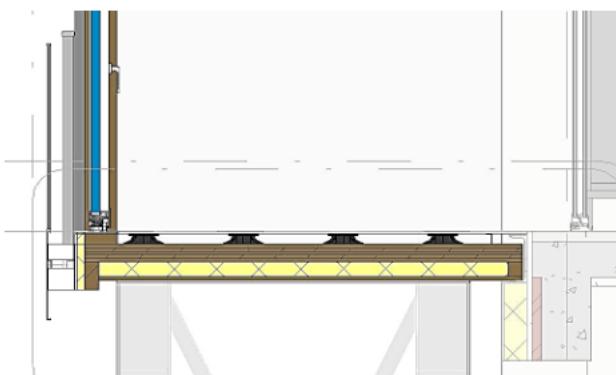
Floor unit: timber slabs pinned to two lateral steel profiles to be fixed to the steel frame.
